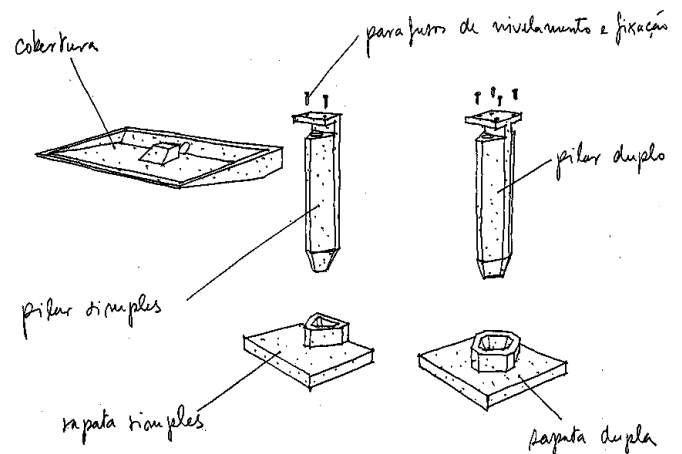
RENURB bus shelter model. Precast reinforced concrete. Design by Lelé, 1979. Arquivo João Filgueiras Lima, Salvador
